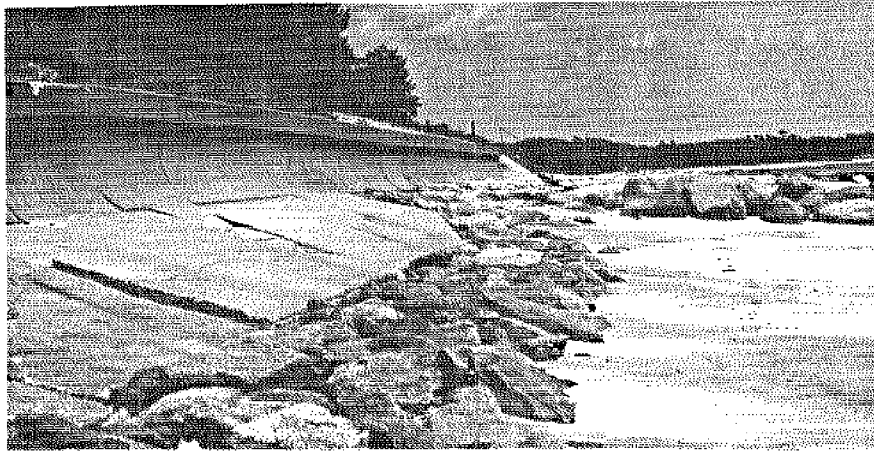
Sta. VI. Seawall and revetment with boulder apron, looking northeast, between groins 10&11.
